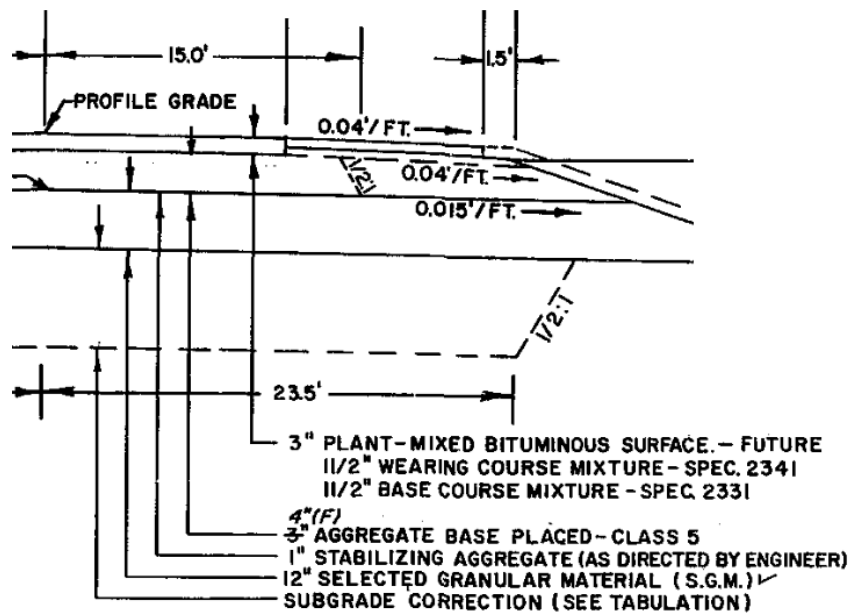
TH 71 mainline typical section (1975 construction plan)
